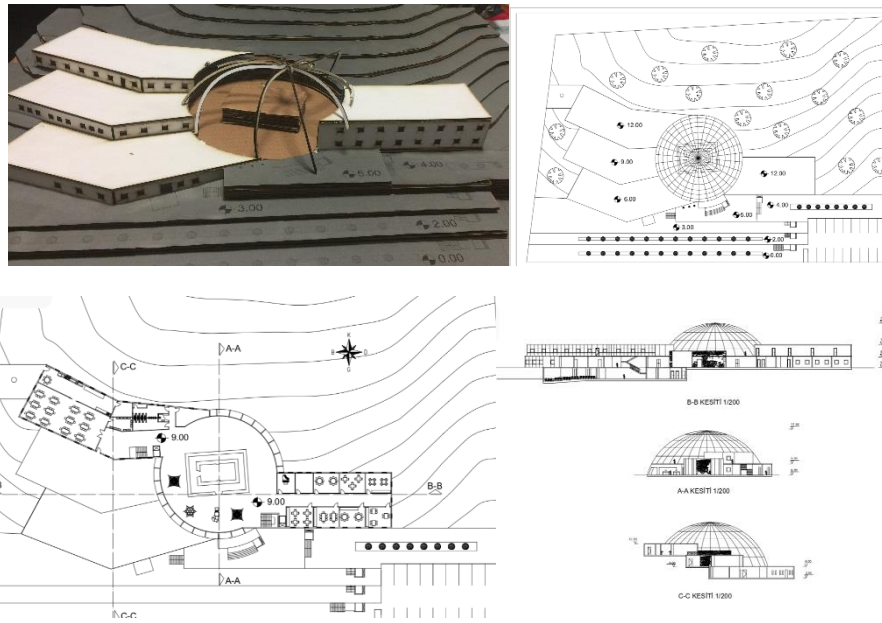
The questionnaire form V: The model, the layout plan, the interior plans and the sections of Project V
